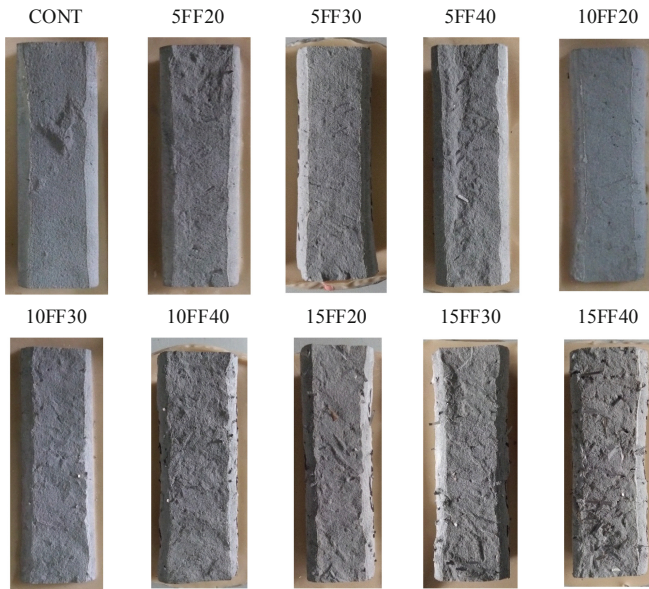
Failure surfaces of printed concrete samples [direct tension tests]
